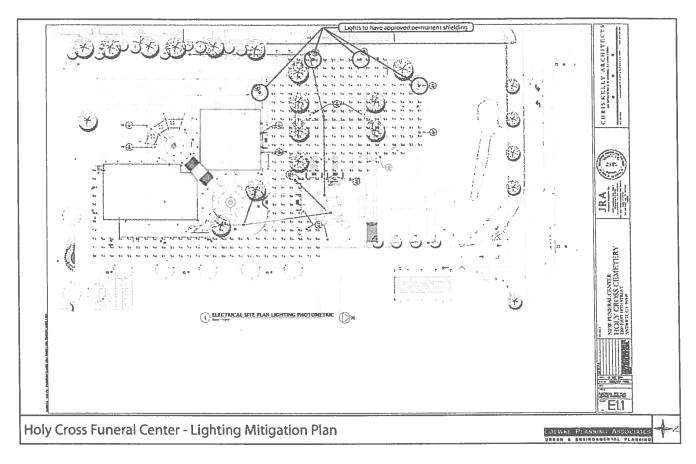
Figure C: Holy Cross Funeral Center Improvement Area - Lighting Mitigation Plan
